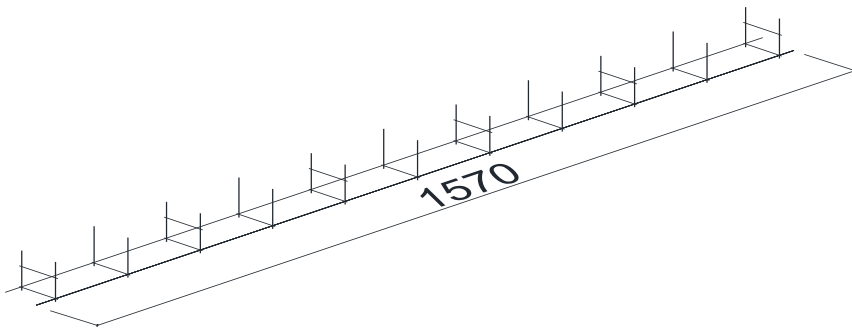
Isometry of a steel cage frame (SNKR-1).
